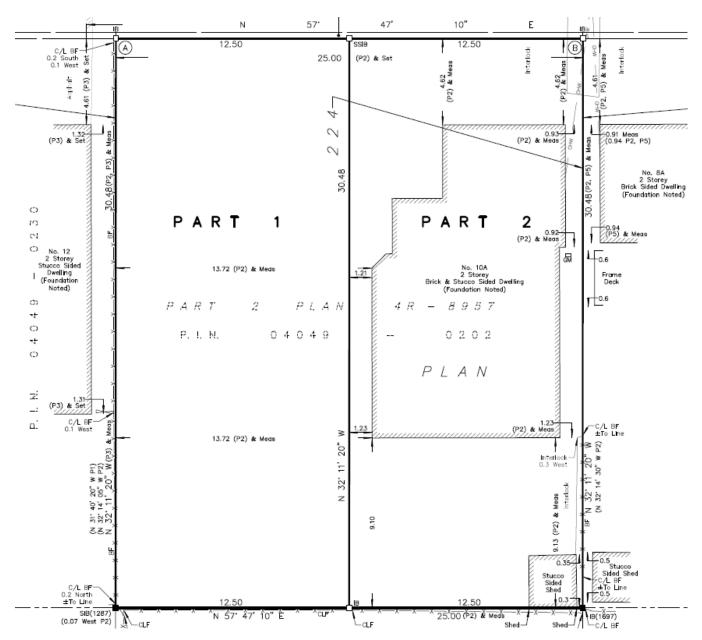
Proposed draft reference plan prepared by Farley, Smith & Denis Surveying Ltd.
